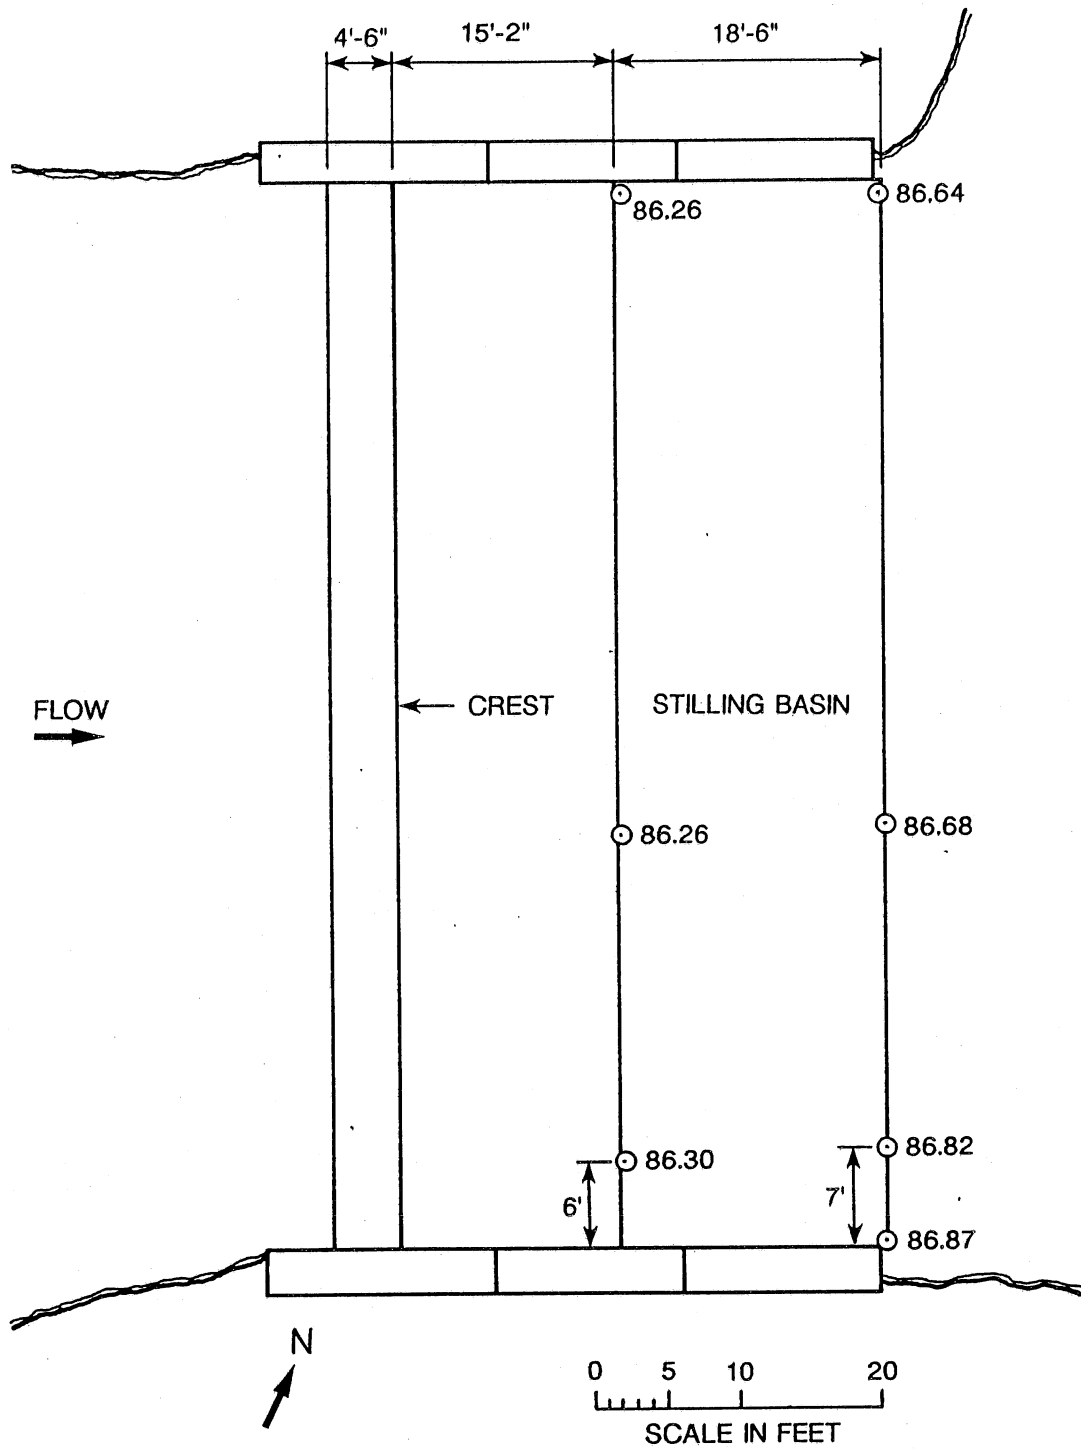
Plan of Kost Dam spillway including apron bed elevations.
